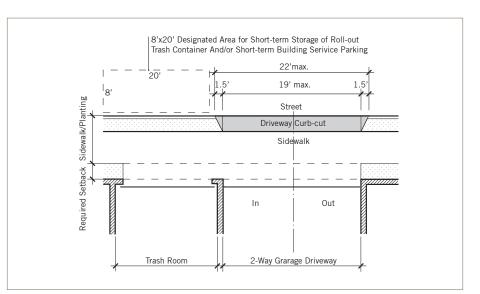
j: Multi-vehicle garage curb cut plan including on-street trash container storage
